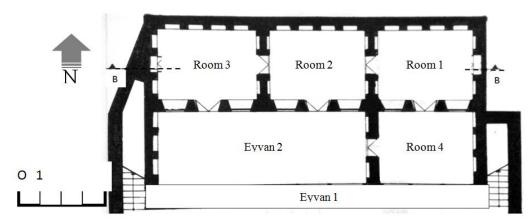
Ground-floor plan of a traditional building in Rasht (Memarian, 2006)
